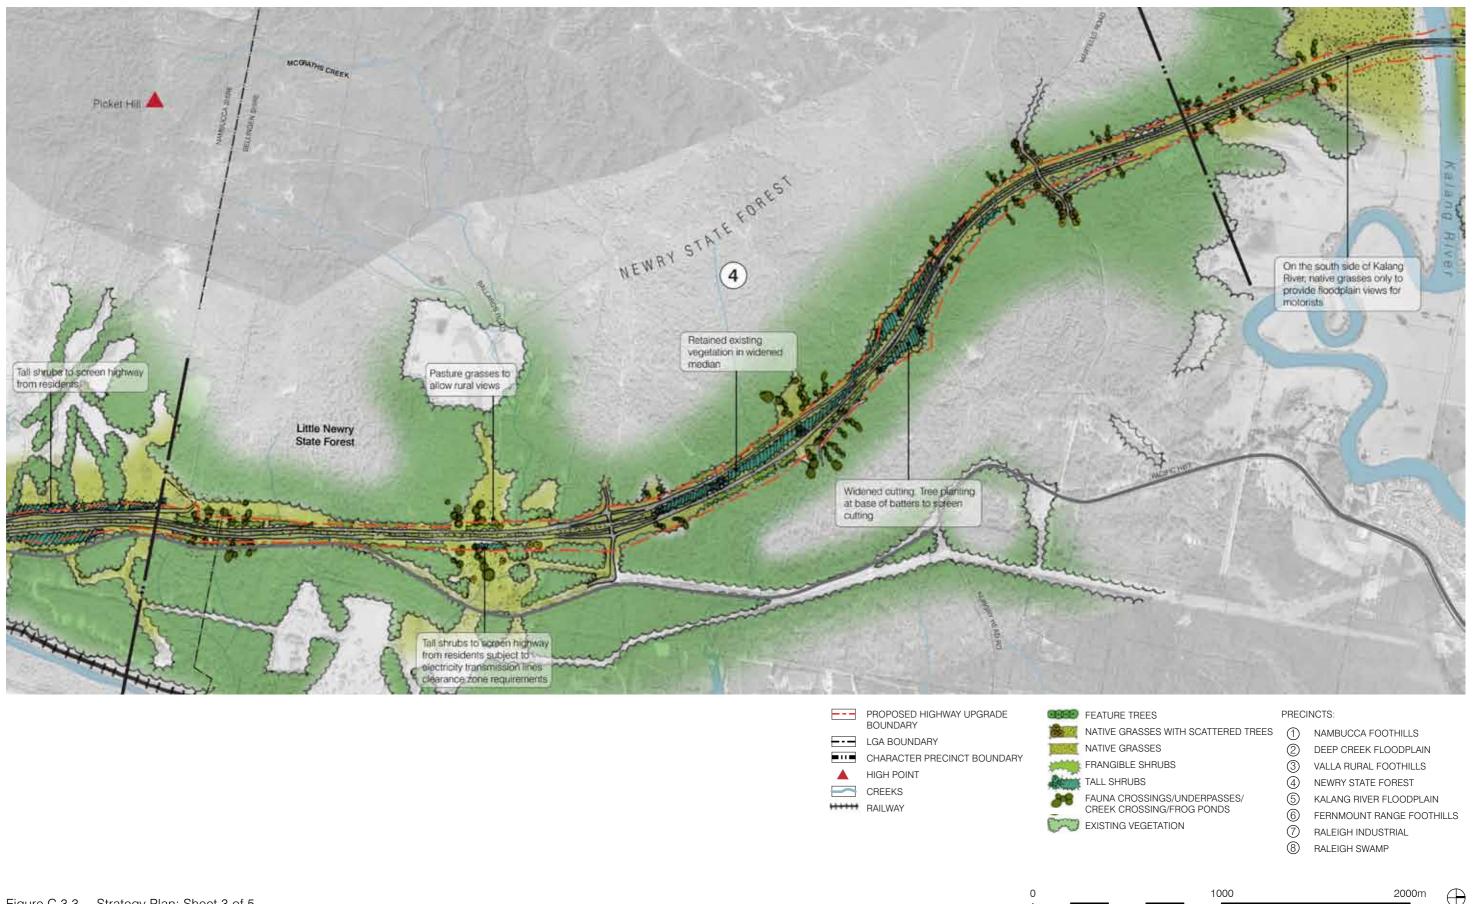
Strategy Plan: Sheet 3 of 5
